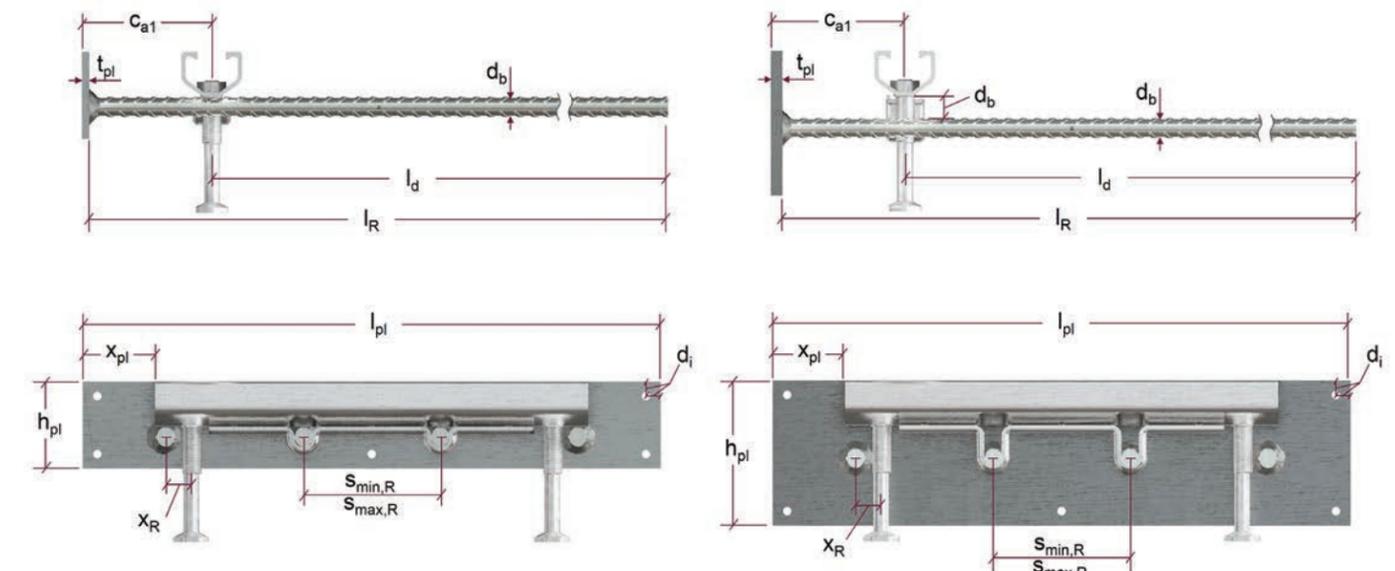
HAC EDGE Lite and HAC EDGE dimensions, section and elevation view.
